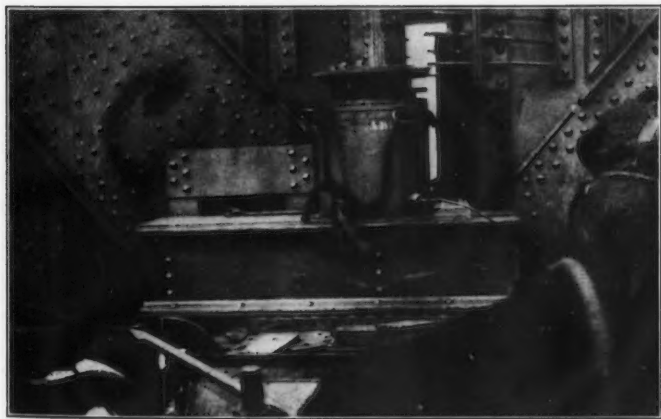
JACK, ON ROLLERS, PIER 5.
